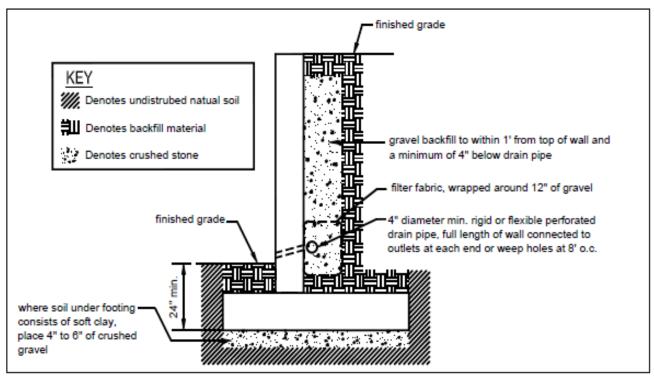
TYPICAL BACKFILL AND DRAINAGE DETAIL
